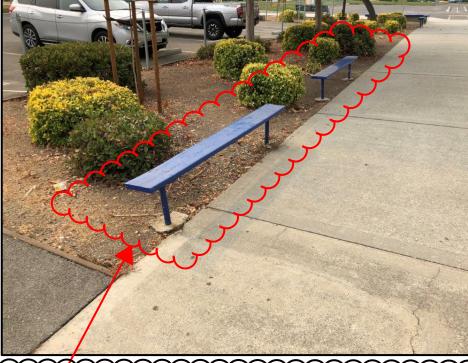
Quantity two (2) existing benches to be removed. Remove concrete footings and backfill.
